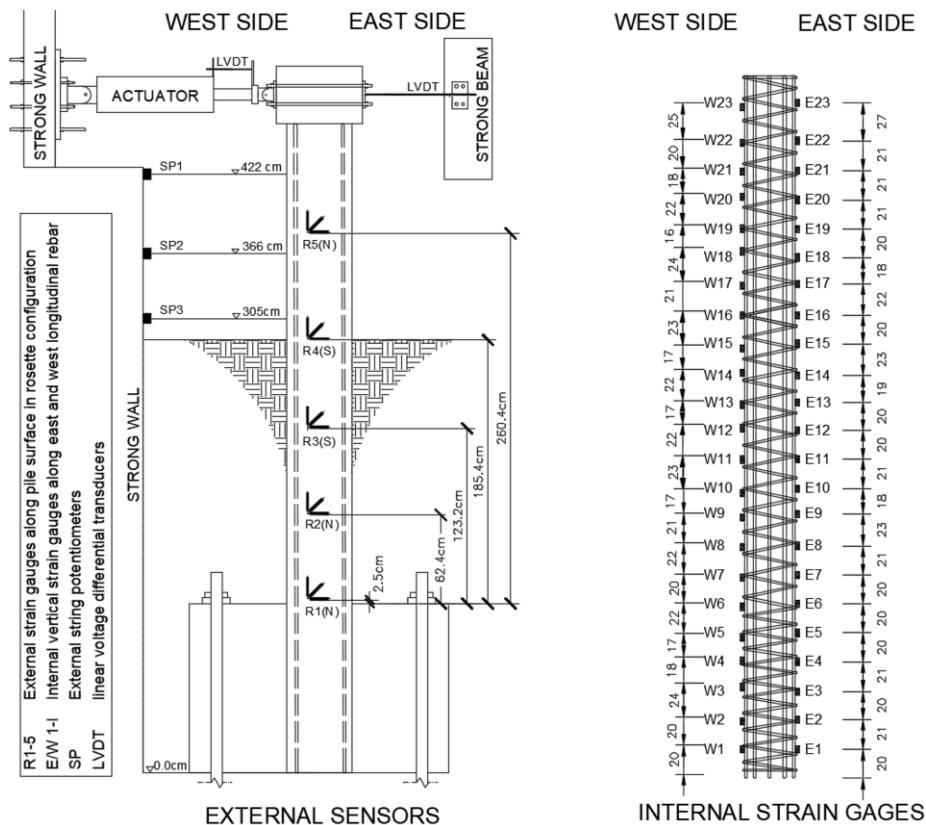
Instrumentation layout for Specimen 1 (tetrahedral sensors not shown, all dimensions in cm).
